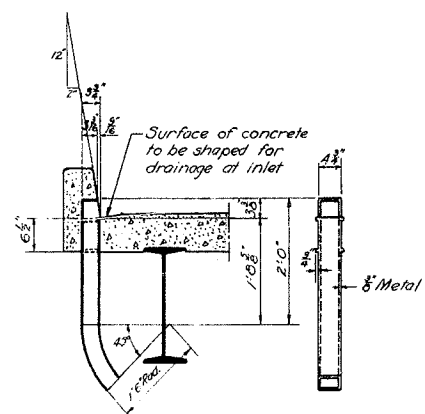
DETAIL OF EXPANSION BRACKET AT JUNCTION OF STEEL SPAN AND PARAPET. For details of Expansion Device, see Standard Drawing No. S-86.
